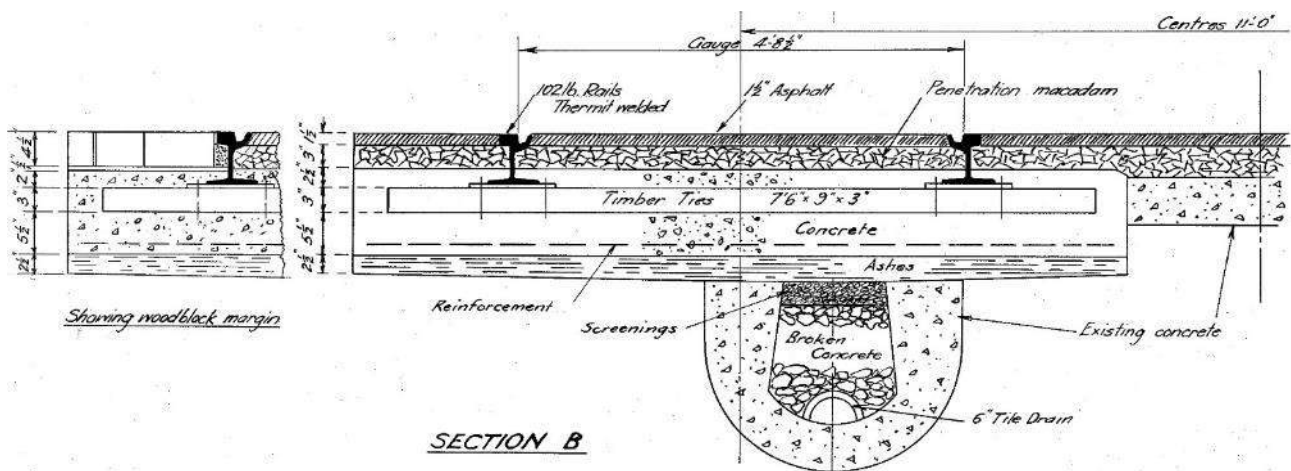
Detail of one of the sections from the MMTB's undated plan of the proposed construction types associated with the tramway conversion along Sydney Road in Brunswick and North Melbourne
